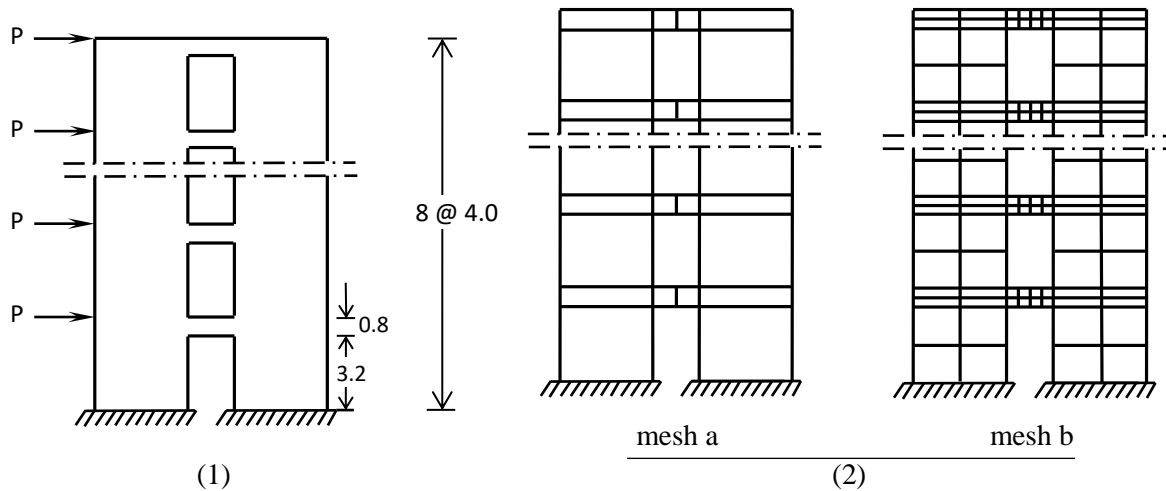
Geometry, load pattern and meshes of the shear wall with opening
